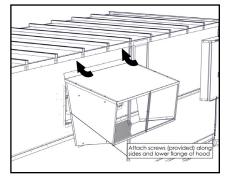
OUTSIDE AIR HOOD INSTALLATION
